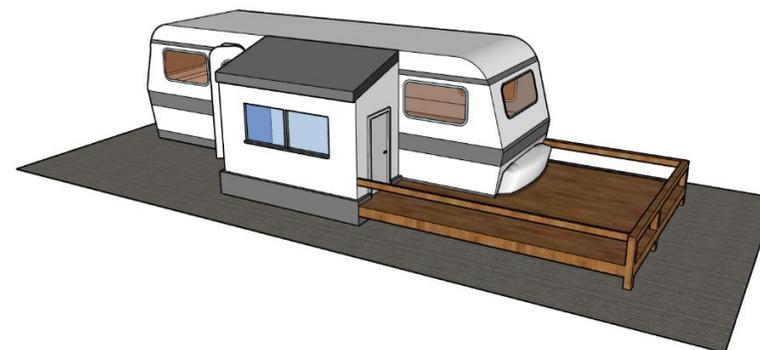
Example of an extension to a caravan rendering that is no longer Caravan Act compliant
